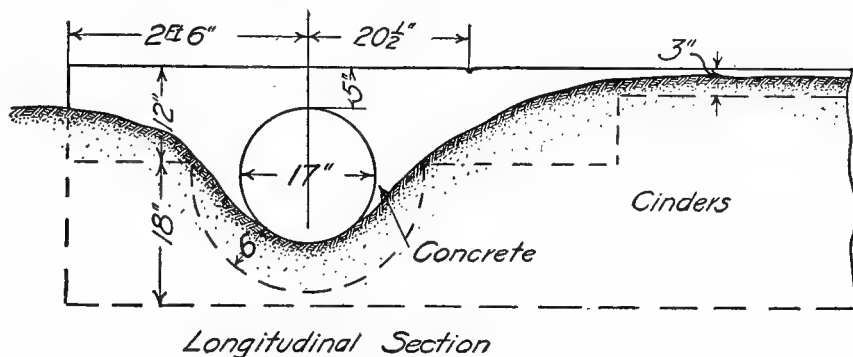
CONCRETE CROSS-WALK OVER GUTTER.
